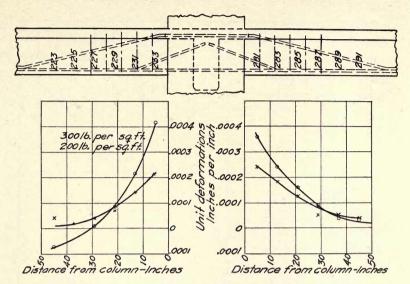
DIAGRAM SHOWING DISTRIBUTION OF COMPRESSIVE DEFORMATION IN BOTTOM OF COLUMN BEAM.
